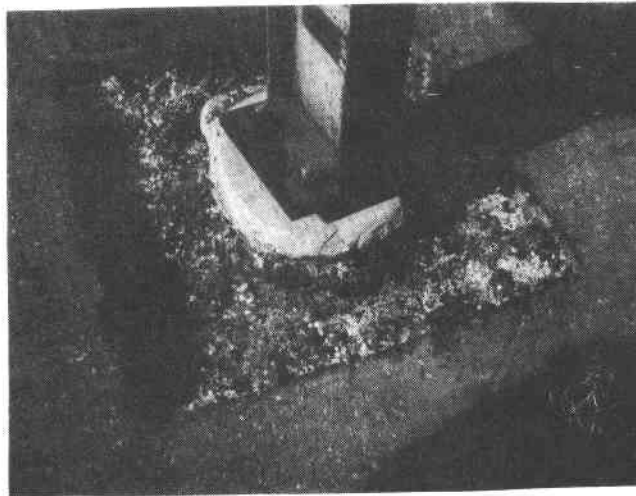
Heavy Duty Test Frame Installed on Pier # 2
